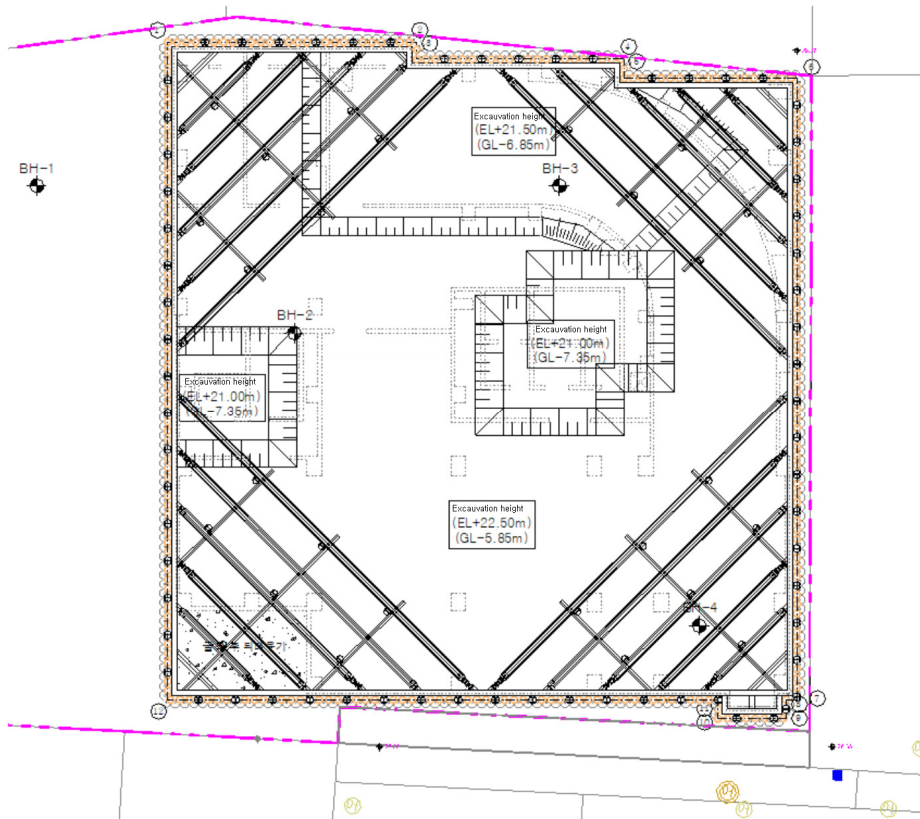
Planned floor plan for construction of earth retaining facilities.
